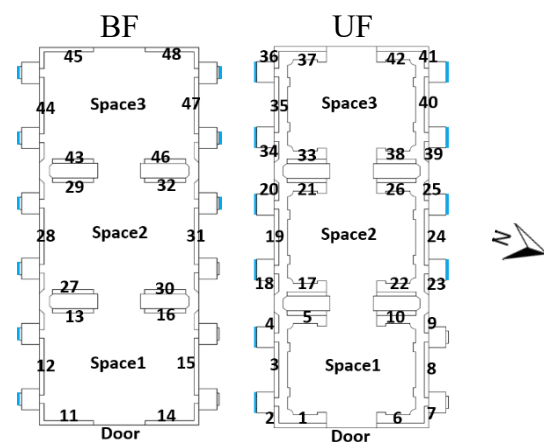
Top view of bottom floor (left) and upper floor (right)
